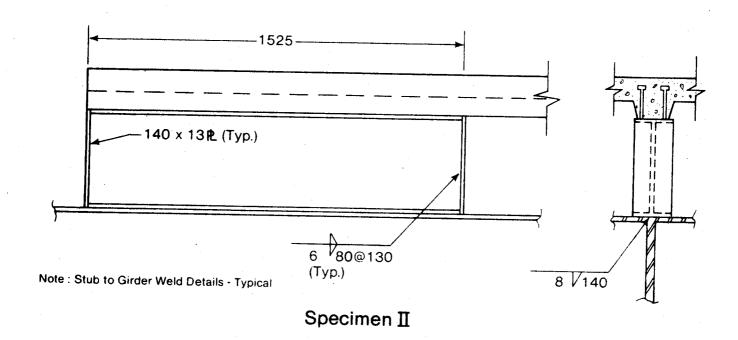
Stub Specimen II : Full End-Plate Stiffeners at Both Ends of Stub
